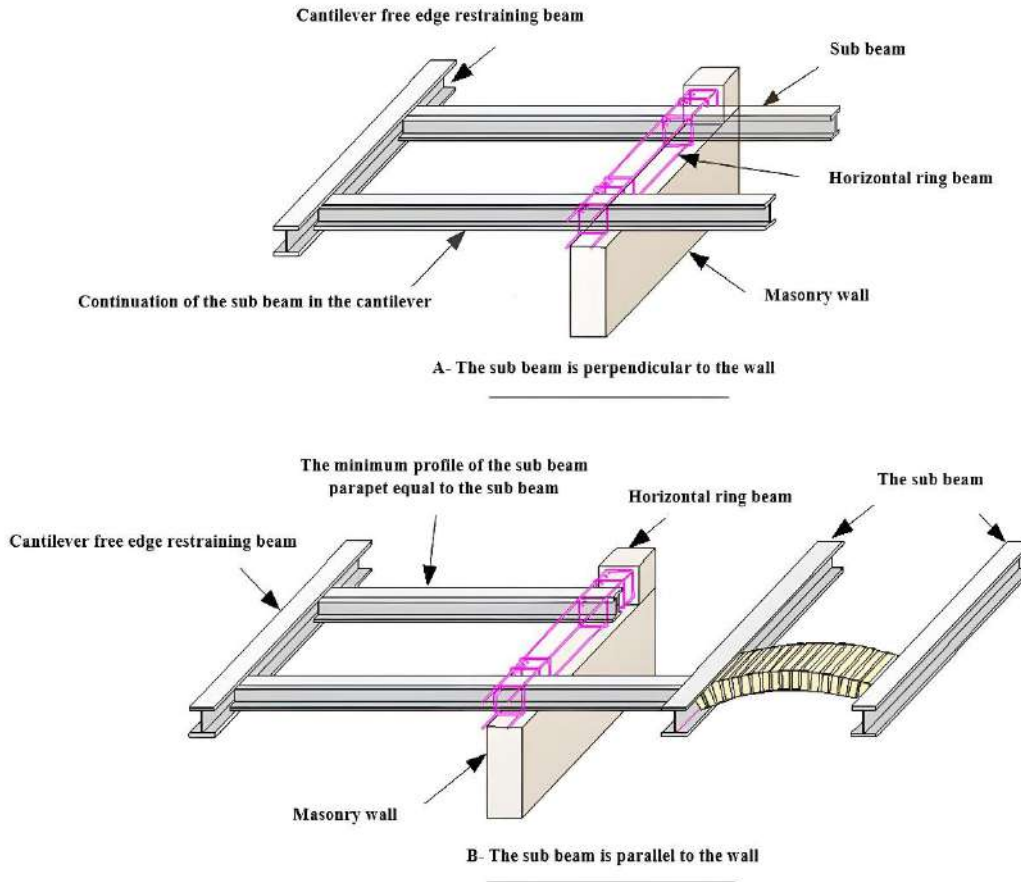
cantilever anchor in the horizontal ring beams of the building based on Iran's 2800 Standard
